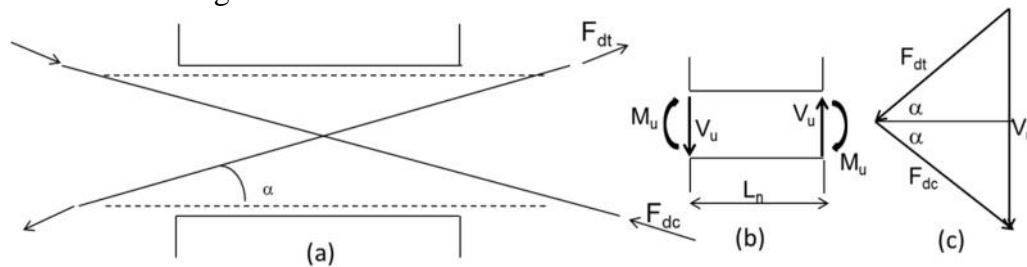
Model of diagonal coupling beam (a) configuration of diagonal bars
